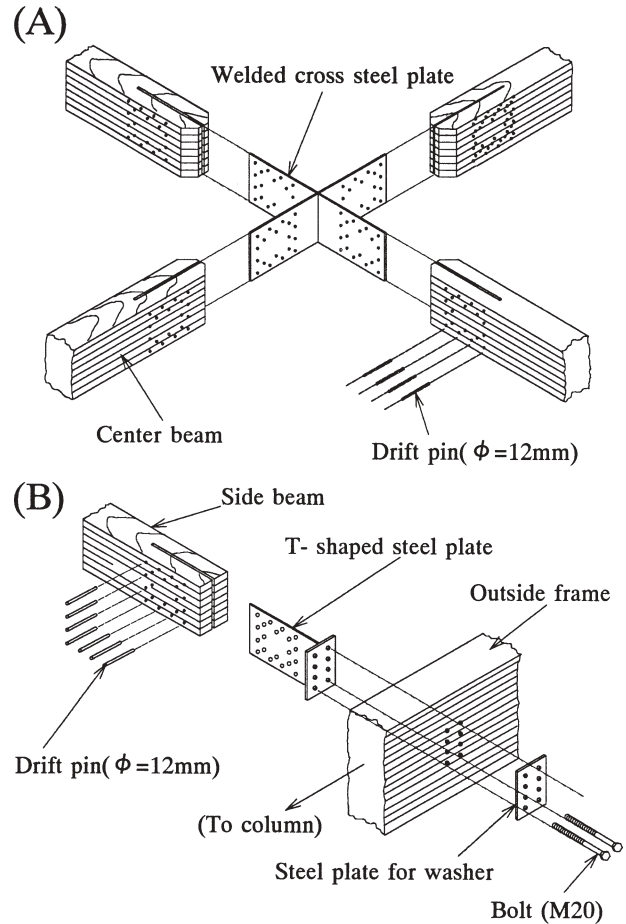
Assembly methods at intersection (A) and at edge section (B)
